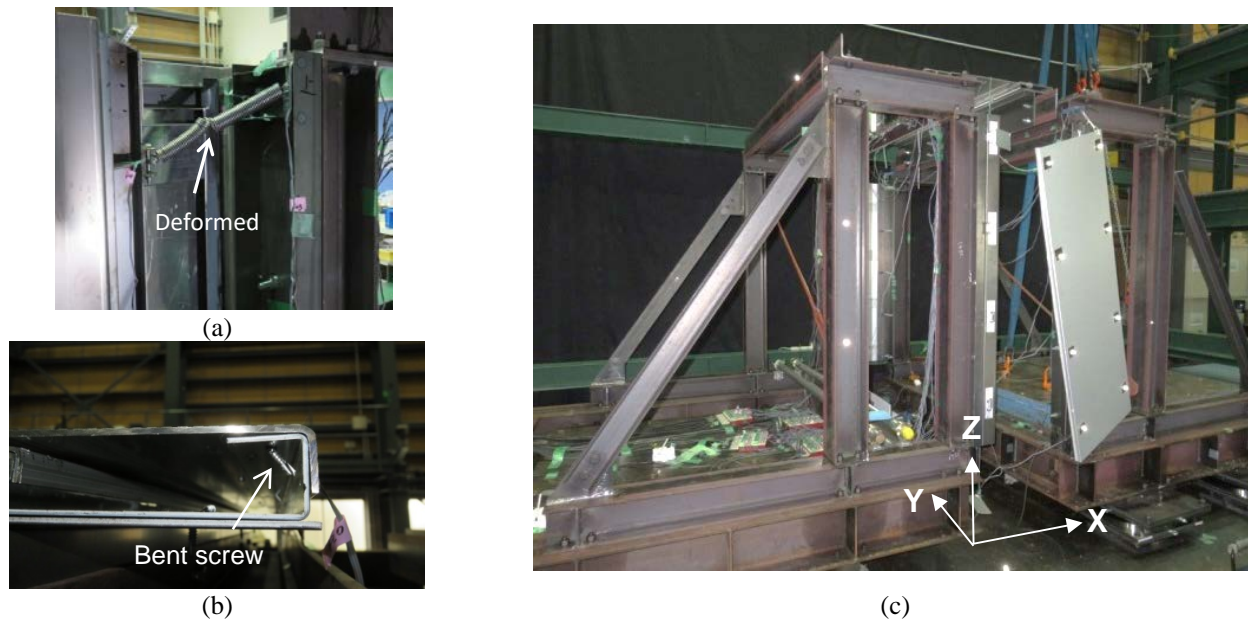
Some of the damage to expansion joints observed in shaking table tests [Otsuki *et al.* 2018a]: (a) HP wall DS1-A (spring deformation), (b) SD floor DS1 (screw rupture), (c) SD wall Failure (cover plate dropped off).
